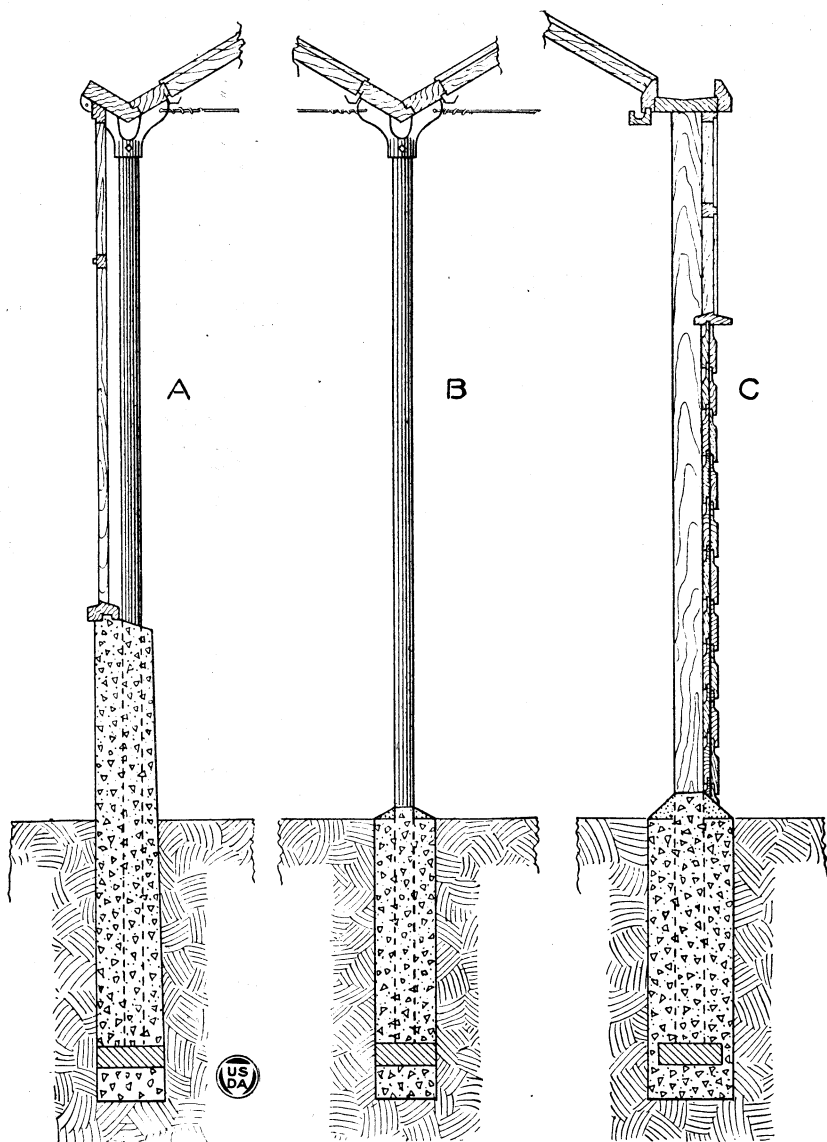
Detailed plans of walls, posts, and gutters for a ridge-and-furrow house: *A*, Outside wall with iron post embedded in concrete; post top fitting and wooden gutter construction. *B*, Inside gutter with iron-pipe post. *C*, Outside wall, wooden post, gutter, and sheathing.
